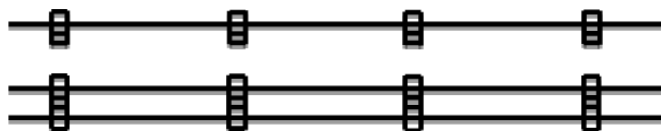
Support structure with cable clamps or brackets. The design with handles/clamps according to Annex B Table 1.
